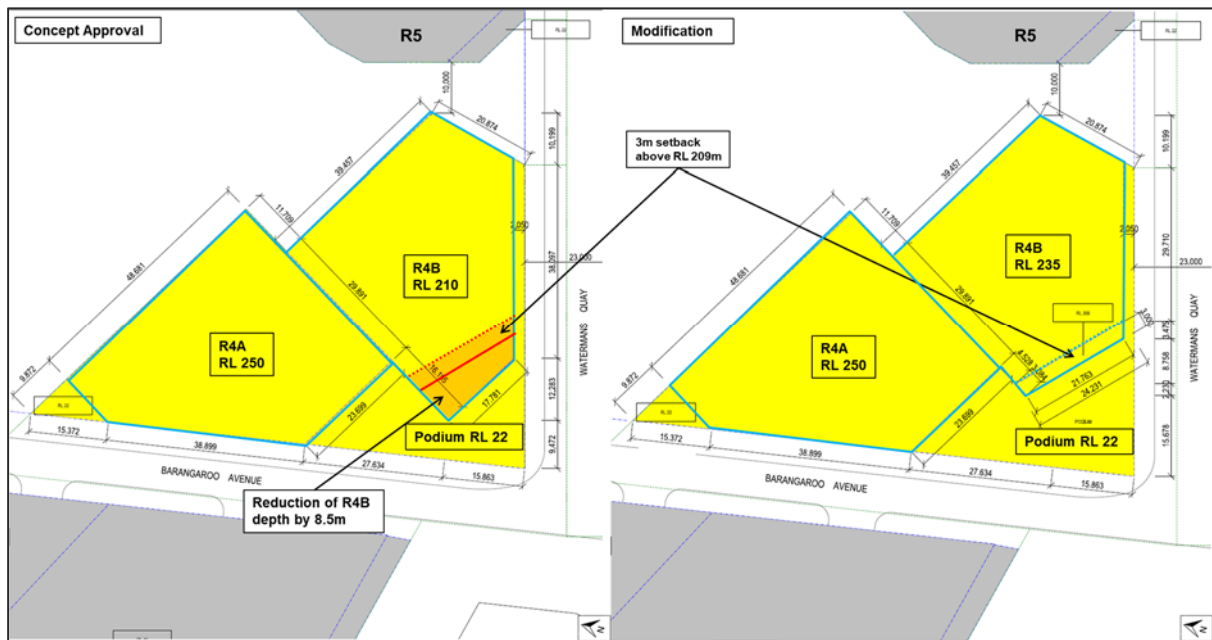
| Approved (left) and proposed (right) Block 4A building envelopes (towers outlined blue) showing the reduction in the R4B tower envelope (south-west corner) and inclusion of 3 m setback above RL 209 m (Base source: Proponent's RtS)
